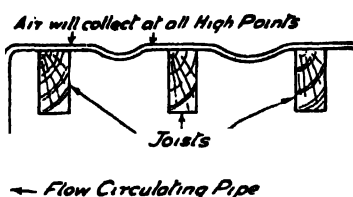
Air lock caused by air collecting at high points when lead pipe sags between joists.
